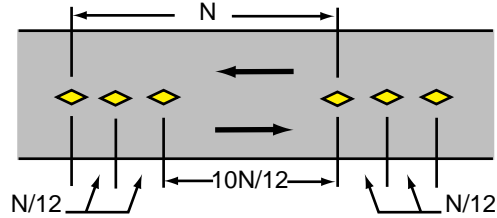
Roadway Pavement Markers Substituting for Pavement Markings
